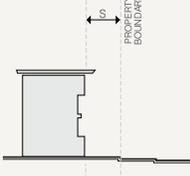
Built form will relate to the street with car parking and servicing behind
